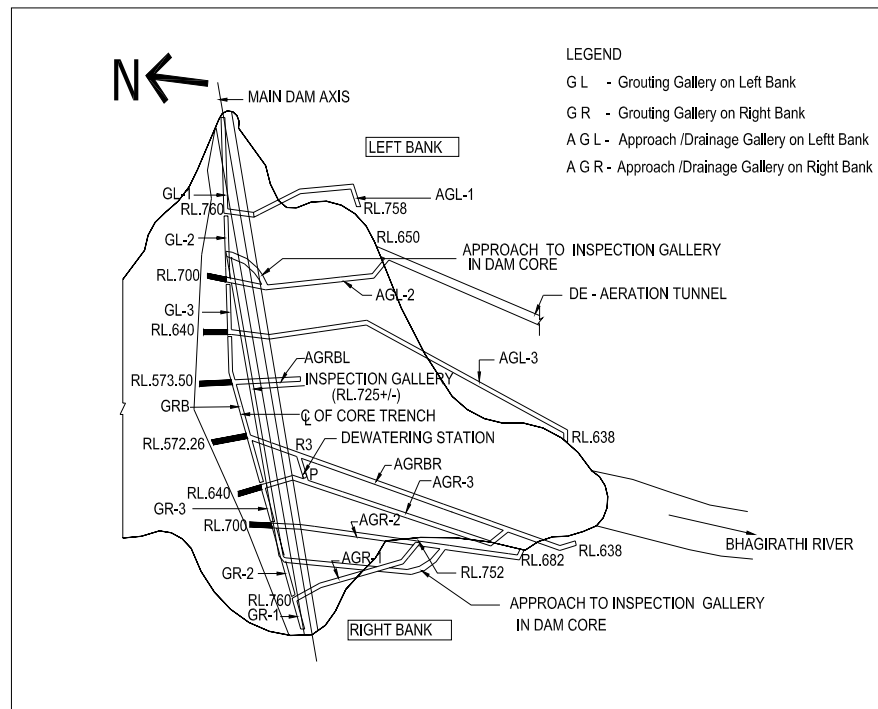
General Arrangement of Grouting & Drainage Galleries in Dam Foundation
